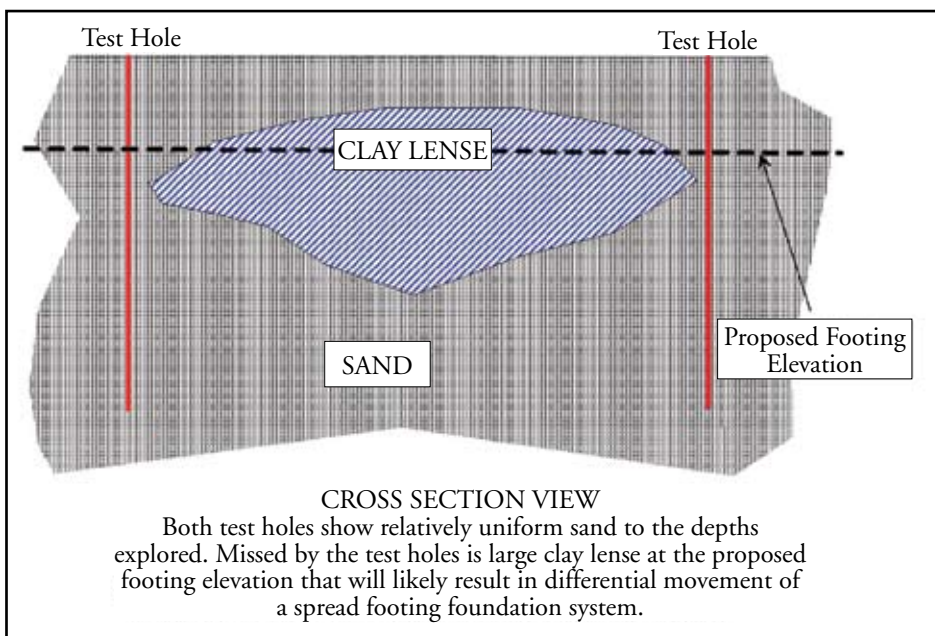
Cross section view - illustration of an unknown geotechnical condition
